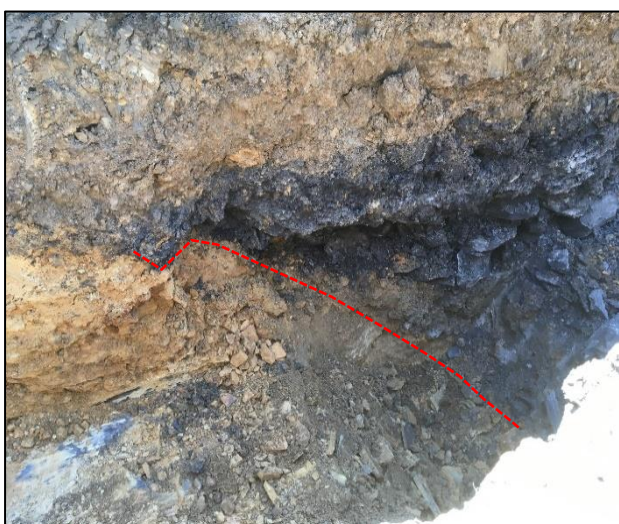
Plate C: Tapering edge of colliery spoil (dark grey) overlying a ramp of weathered bedrock (suspected highwall) in TT106b / 106c. Facing south.
